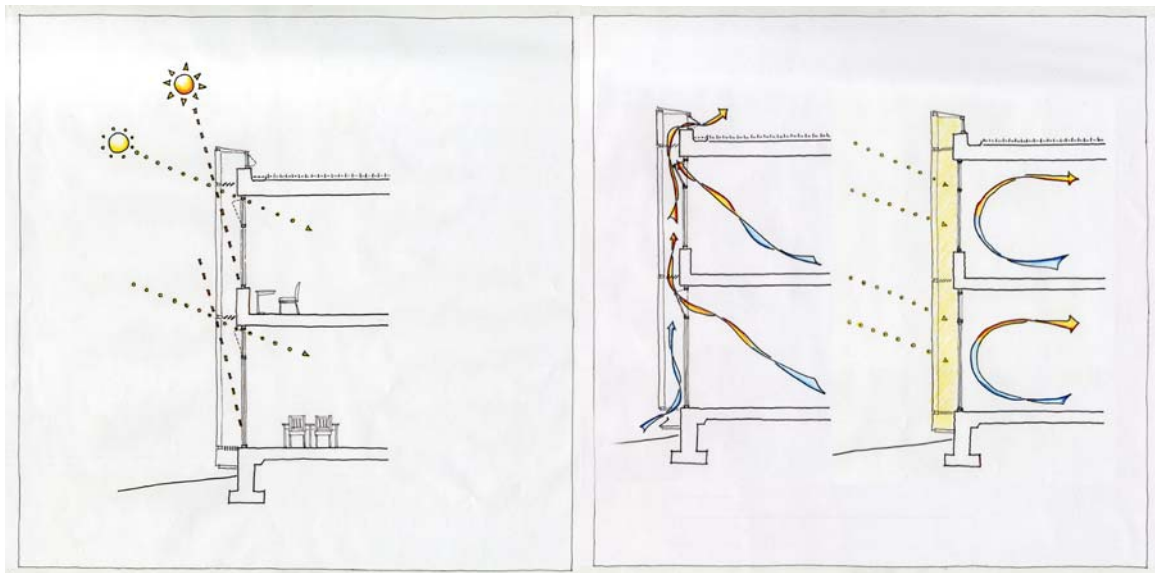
Wall Section Diagram: Cooling and heating mode of Double Skin
